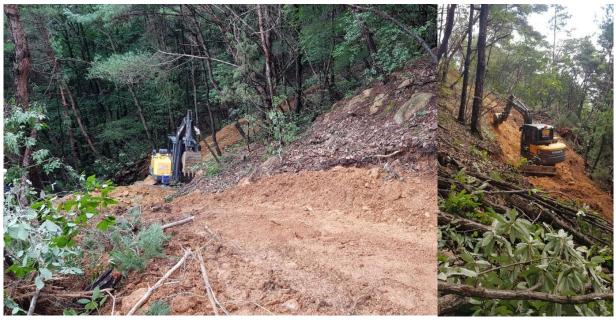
(left) – Track construction in steep terrain (looking west from Pad 2); and Photo 2 (right) – New Weolyu Drill Pad under construction (looking North East), displaying the ability of local operators
